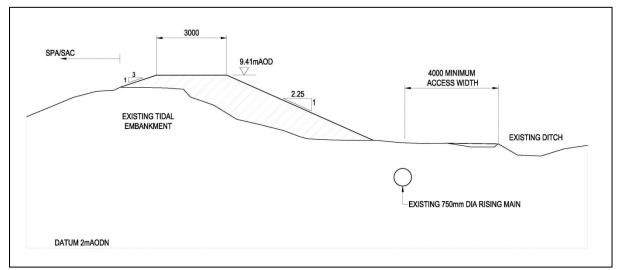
Indicative embankment cross section (sections where Redi-Rock (or similar) wall is not required)
